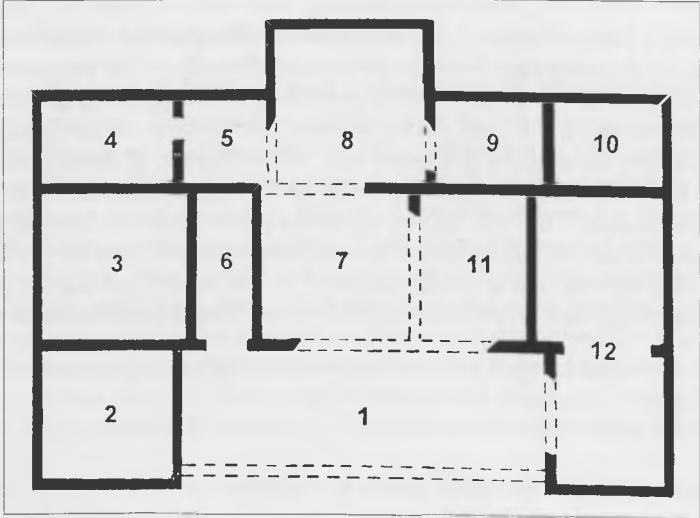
Room Plan, West Wing, Brading Roman Villa.
